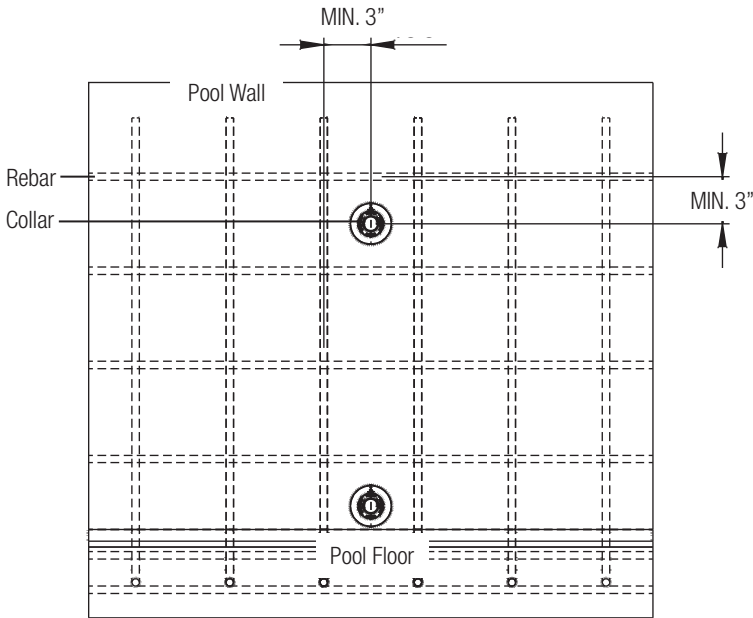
Collar Installation on Pool Wall with Rebar (Front View)
